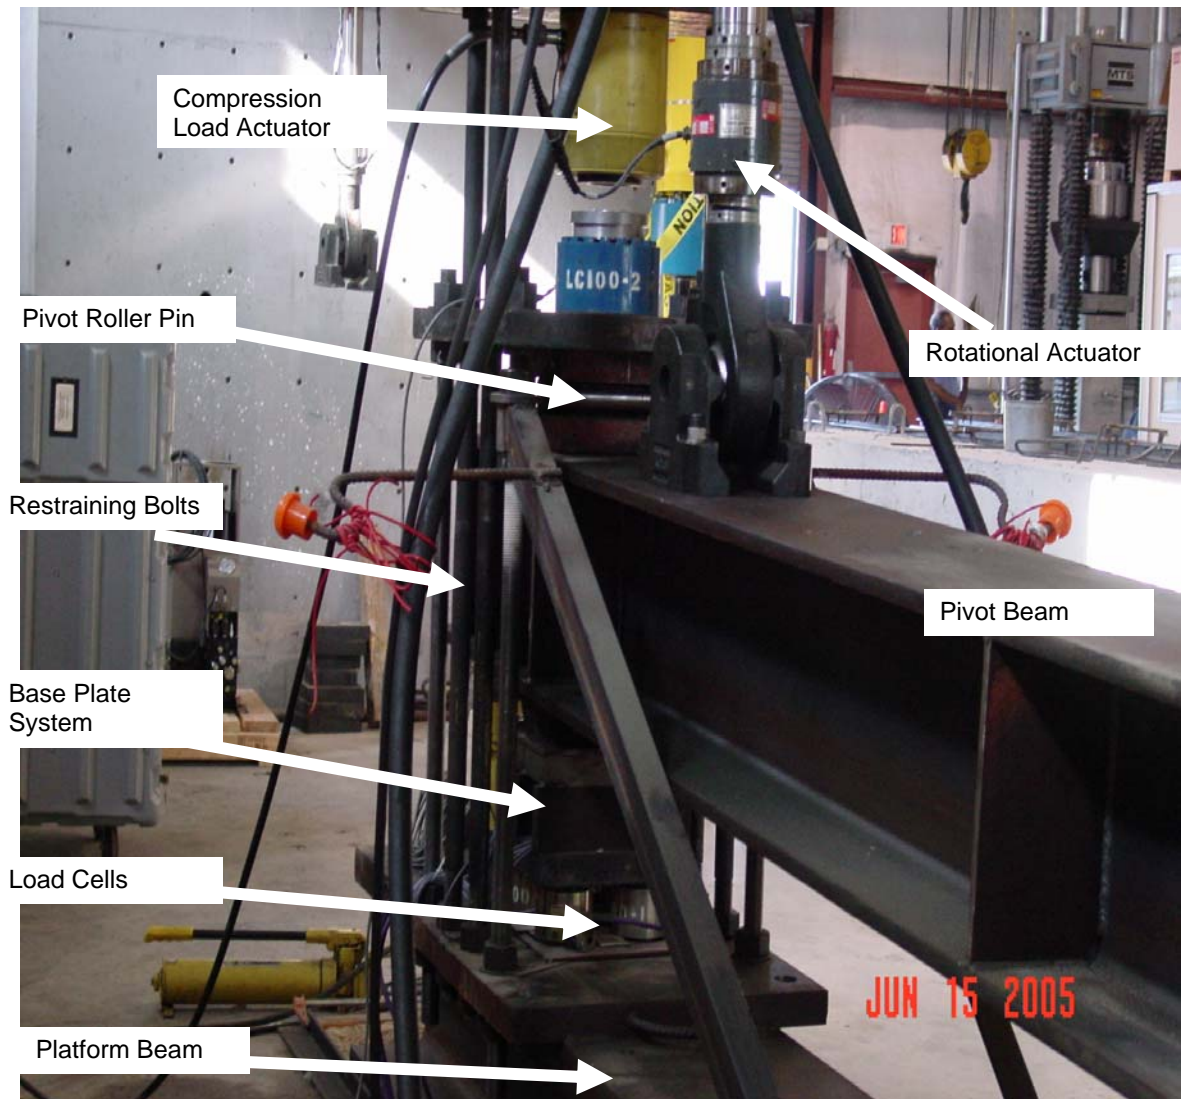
View 1 of the Combined Loading Testing Assembly
